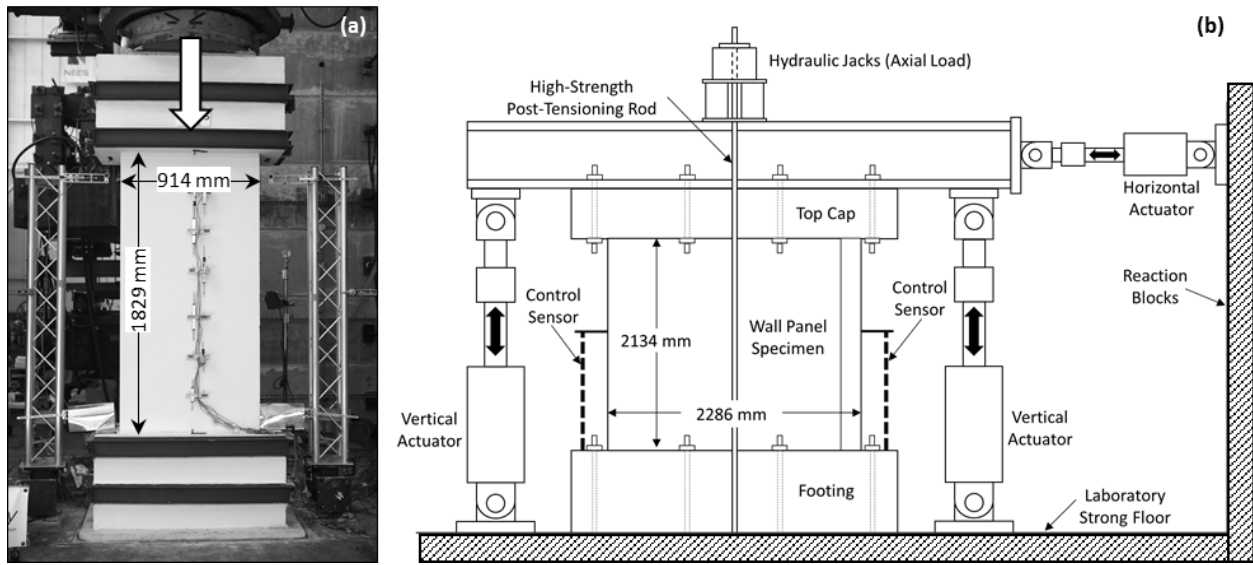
Test setup for (a) isolated boundary element test; and (b) wall panel test
